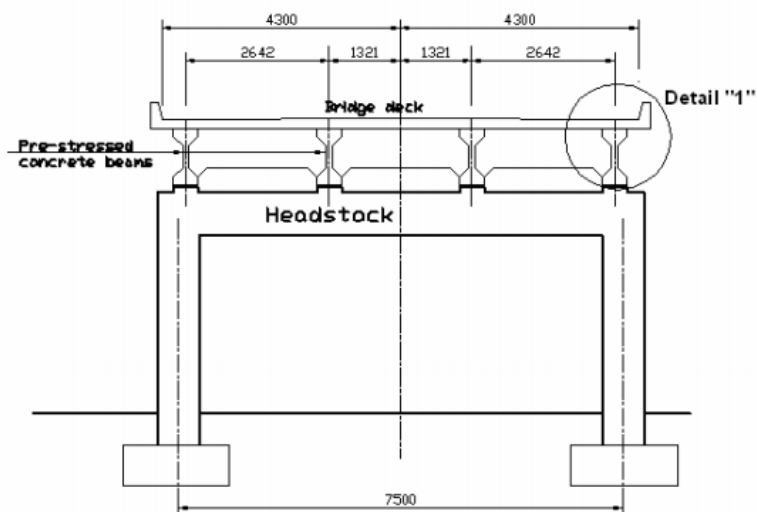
SECTION DETAIL OF THE TENTHILL CREEK BRIDGE [10]
